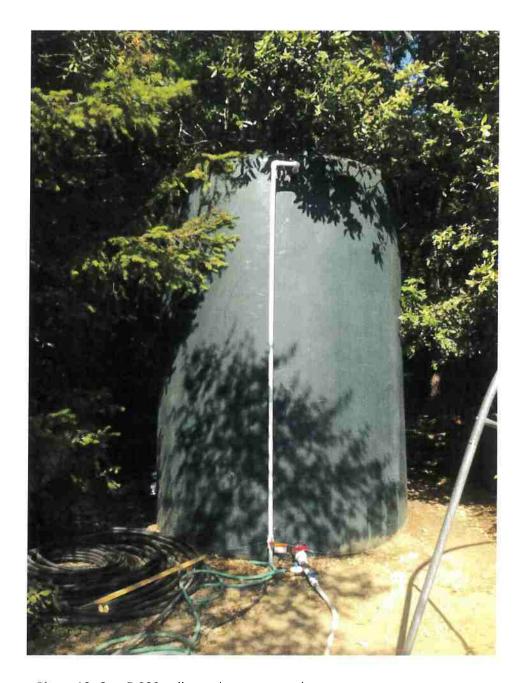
One 5,000 gallon poly storage tank. Photo date 9-8-16
